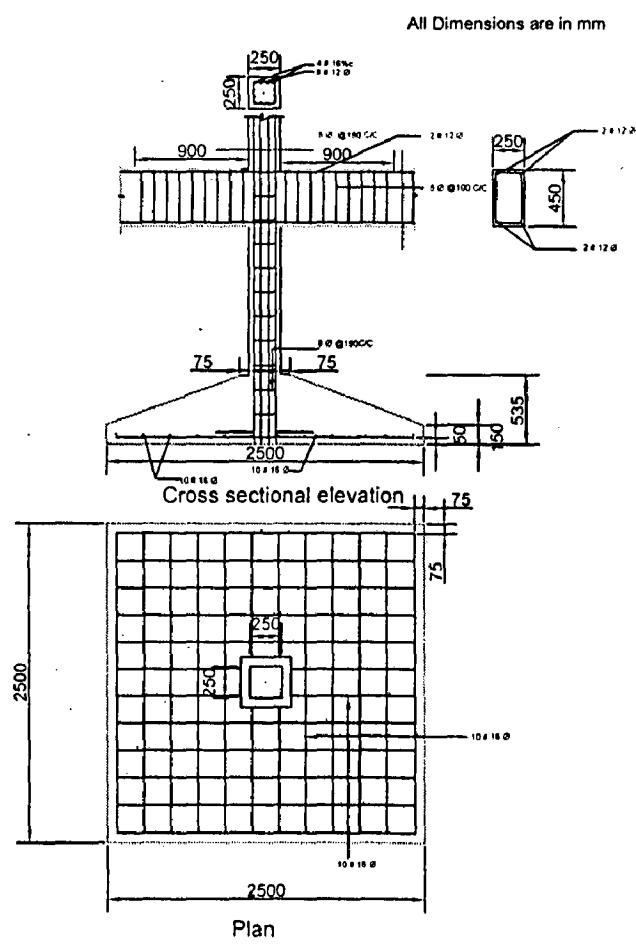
Details of column and footing reinforcement of interior frame for static case
